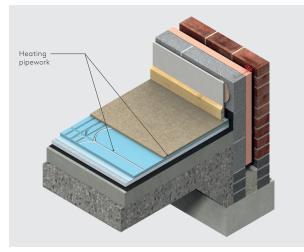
Intermittent heating applications - installed onto concrete floor, underneath timber floating floor
